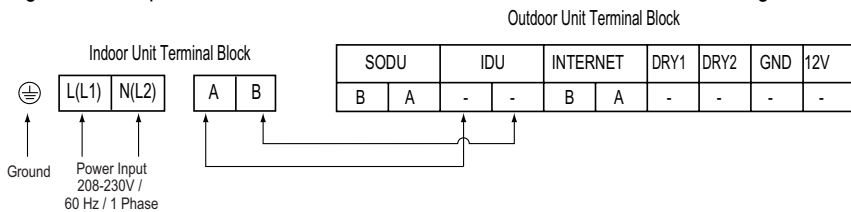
Simplified View of Indoor Unit Terminal Connections--Ceiling Suspended.
